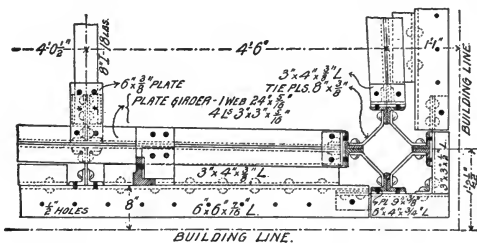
Detail of Wall Girders and Corner Column. Reliance Building.
